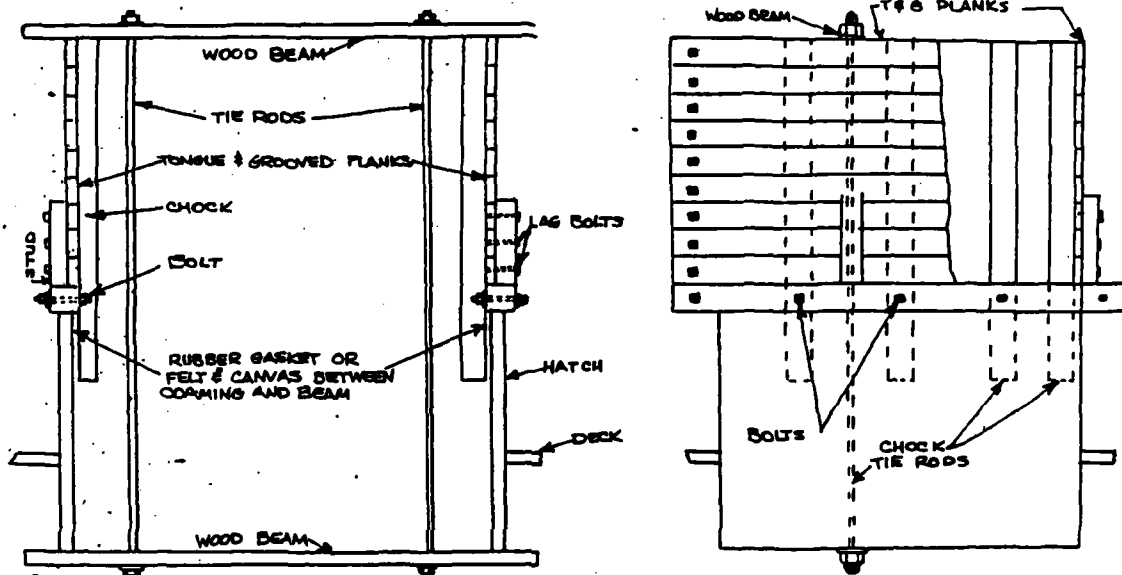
SAMPLE COFFERDAM CONSTRUCTION [13]
